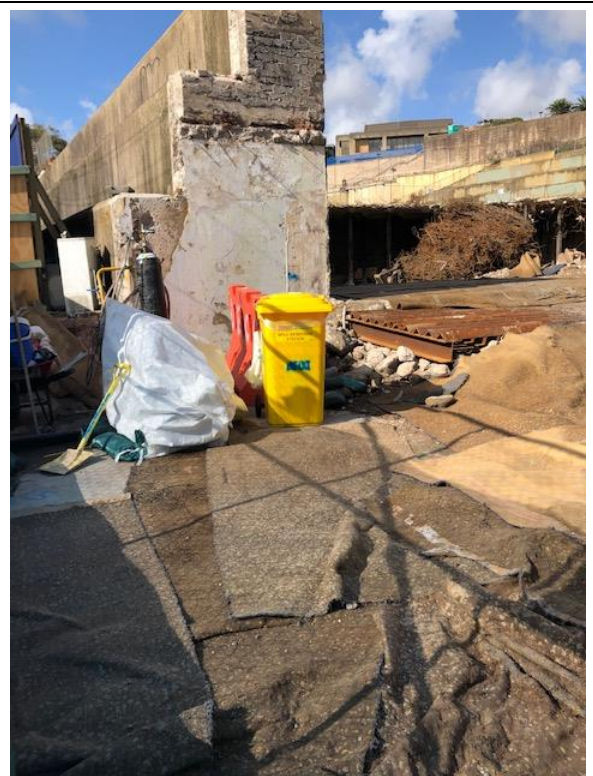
Cattle grid and geofabric lining of exposed areas, Lincoln Crescent site access. Spill kit.
